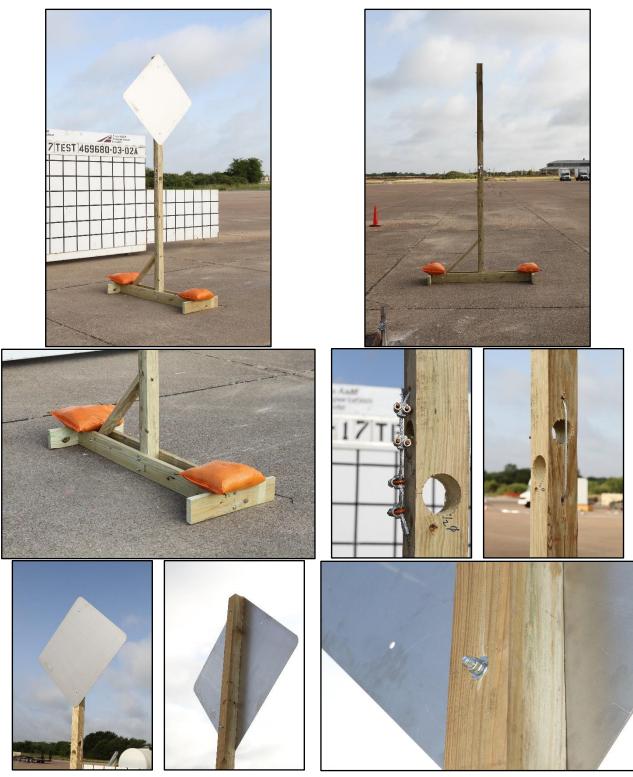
Modified TxDOT Single Skid-Mounted Sign Support (First Modification) prior to Crash Test No. 469680-03-2A.
